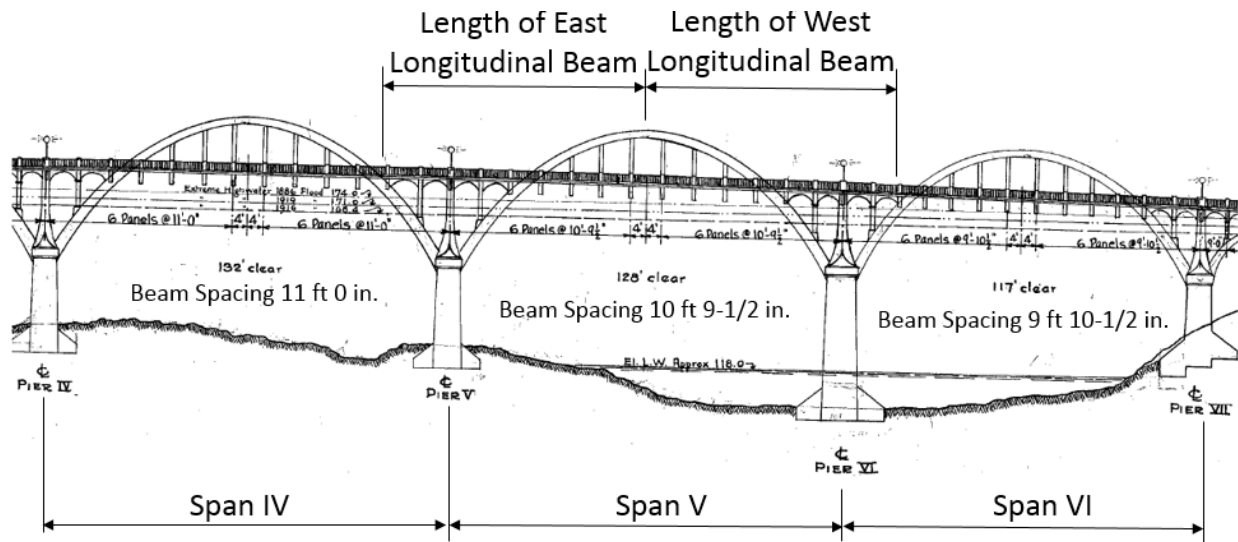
West Longitudinal Beam in Relation to East Longitudinal Beam (AHD 1929)
